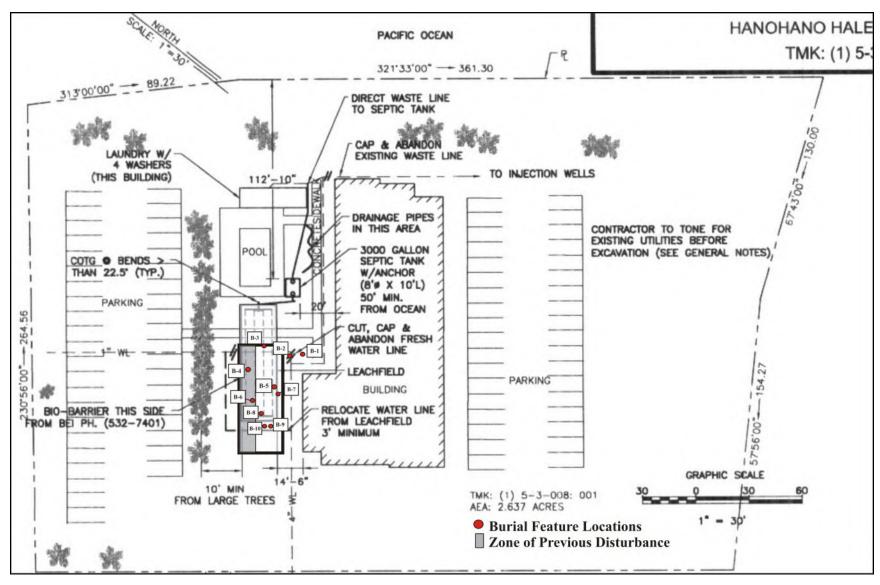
Revised GWS Excavation Plan Depicting Site 50-80-06-7120 Burial Feature Locations and Zone of Previous Disturbance (Note: Revised Excavation Plan Overlays Original Plan.
